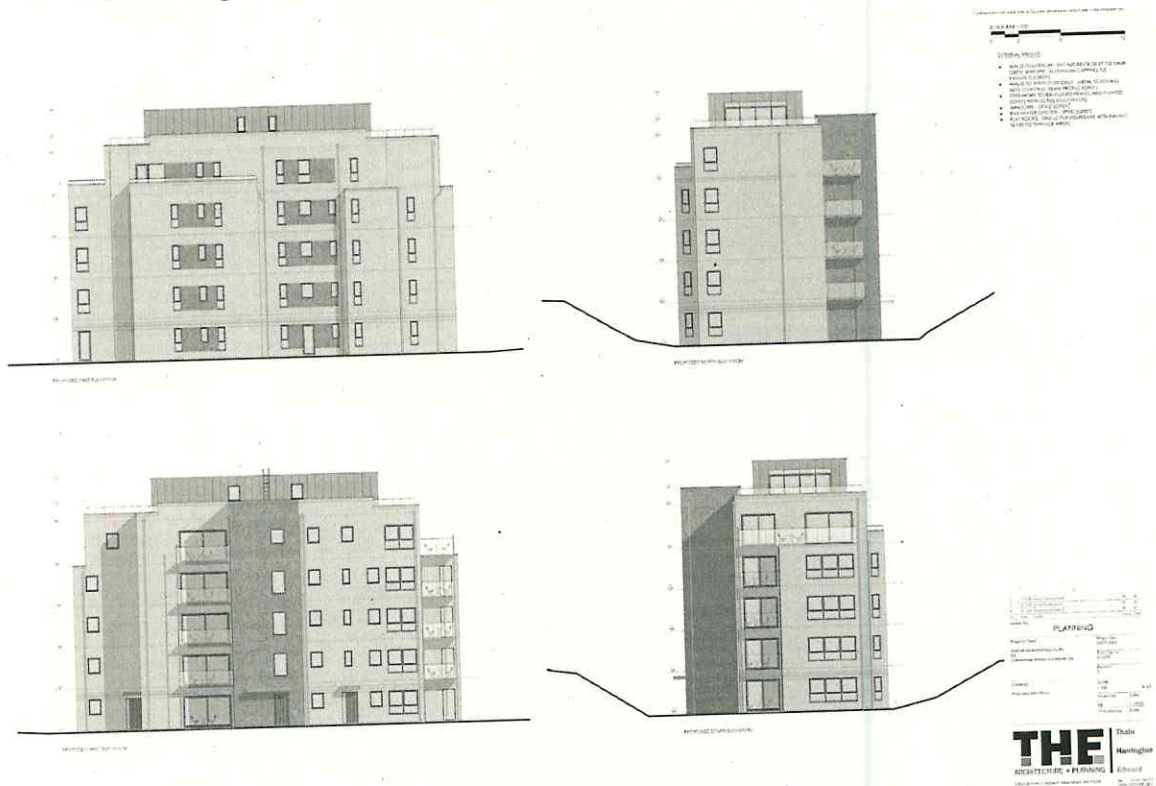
Proposed elevations of the South Groathill Road development (Source: THE Architecture & Planning)
